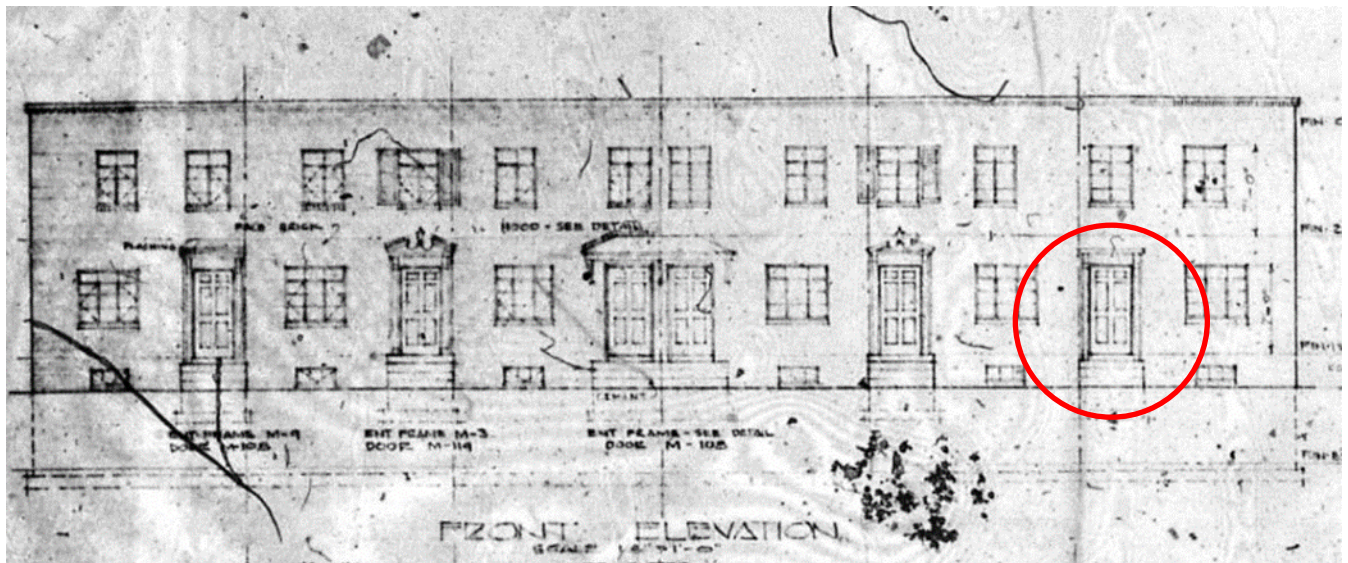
Patrick Henry Homes, Block 2, front elevation. Permit #3335
